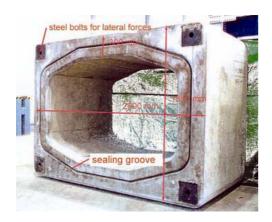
The prototype of a new rectangular reinforced concrete pipe
